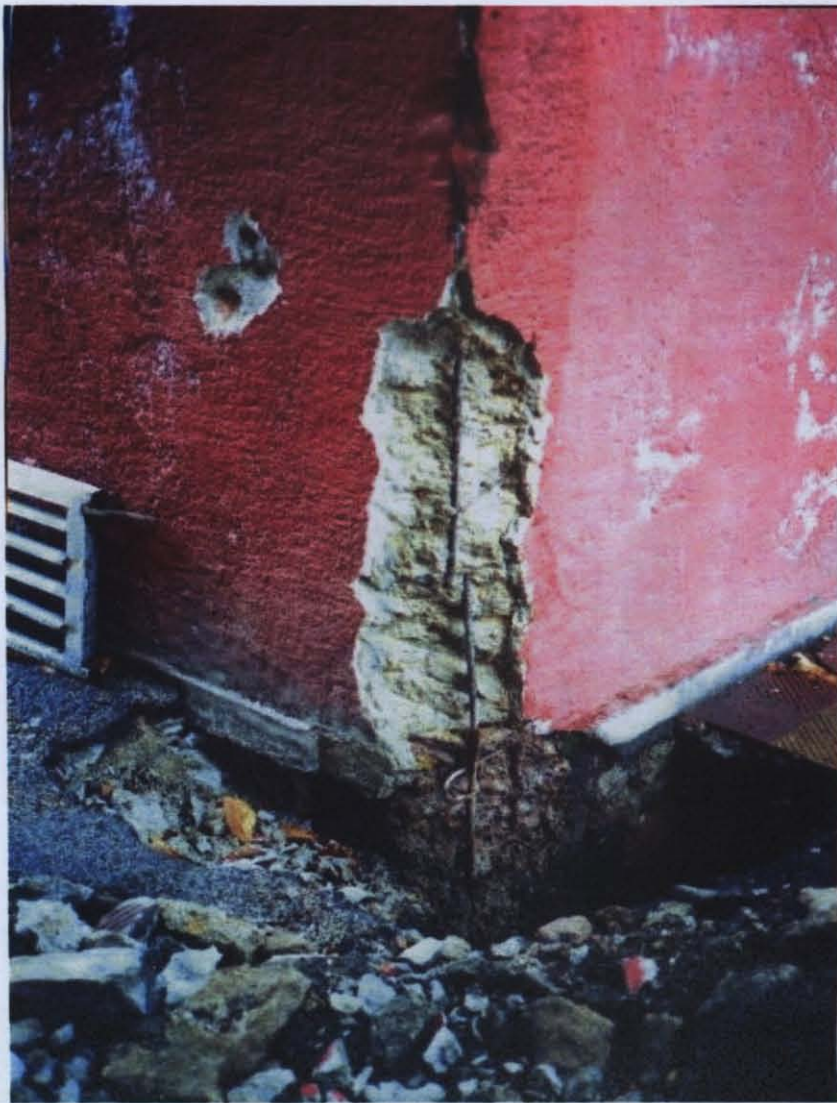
Lack of confinement and longitudinal rebar problem at Üsküdar Halil Rüştü İ.Ö.O.
